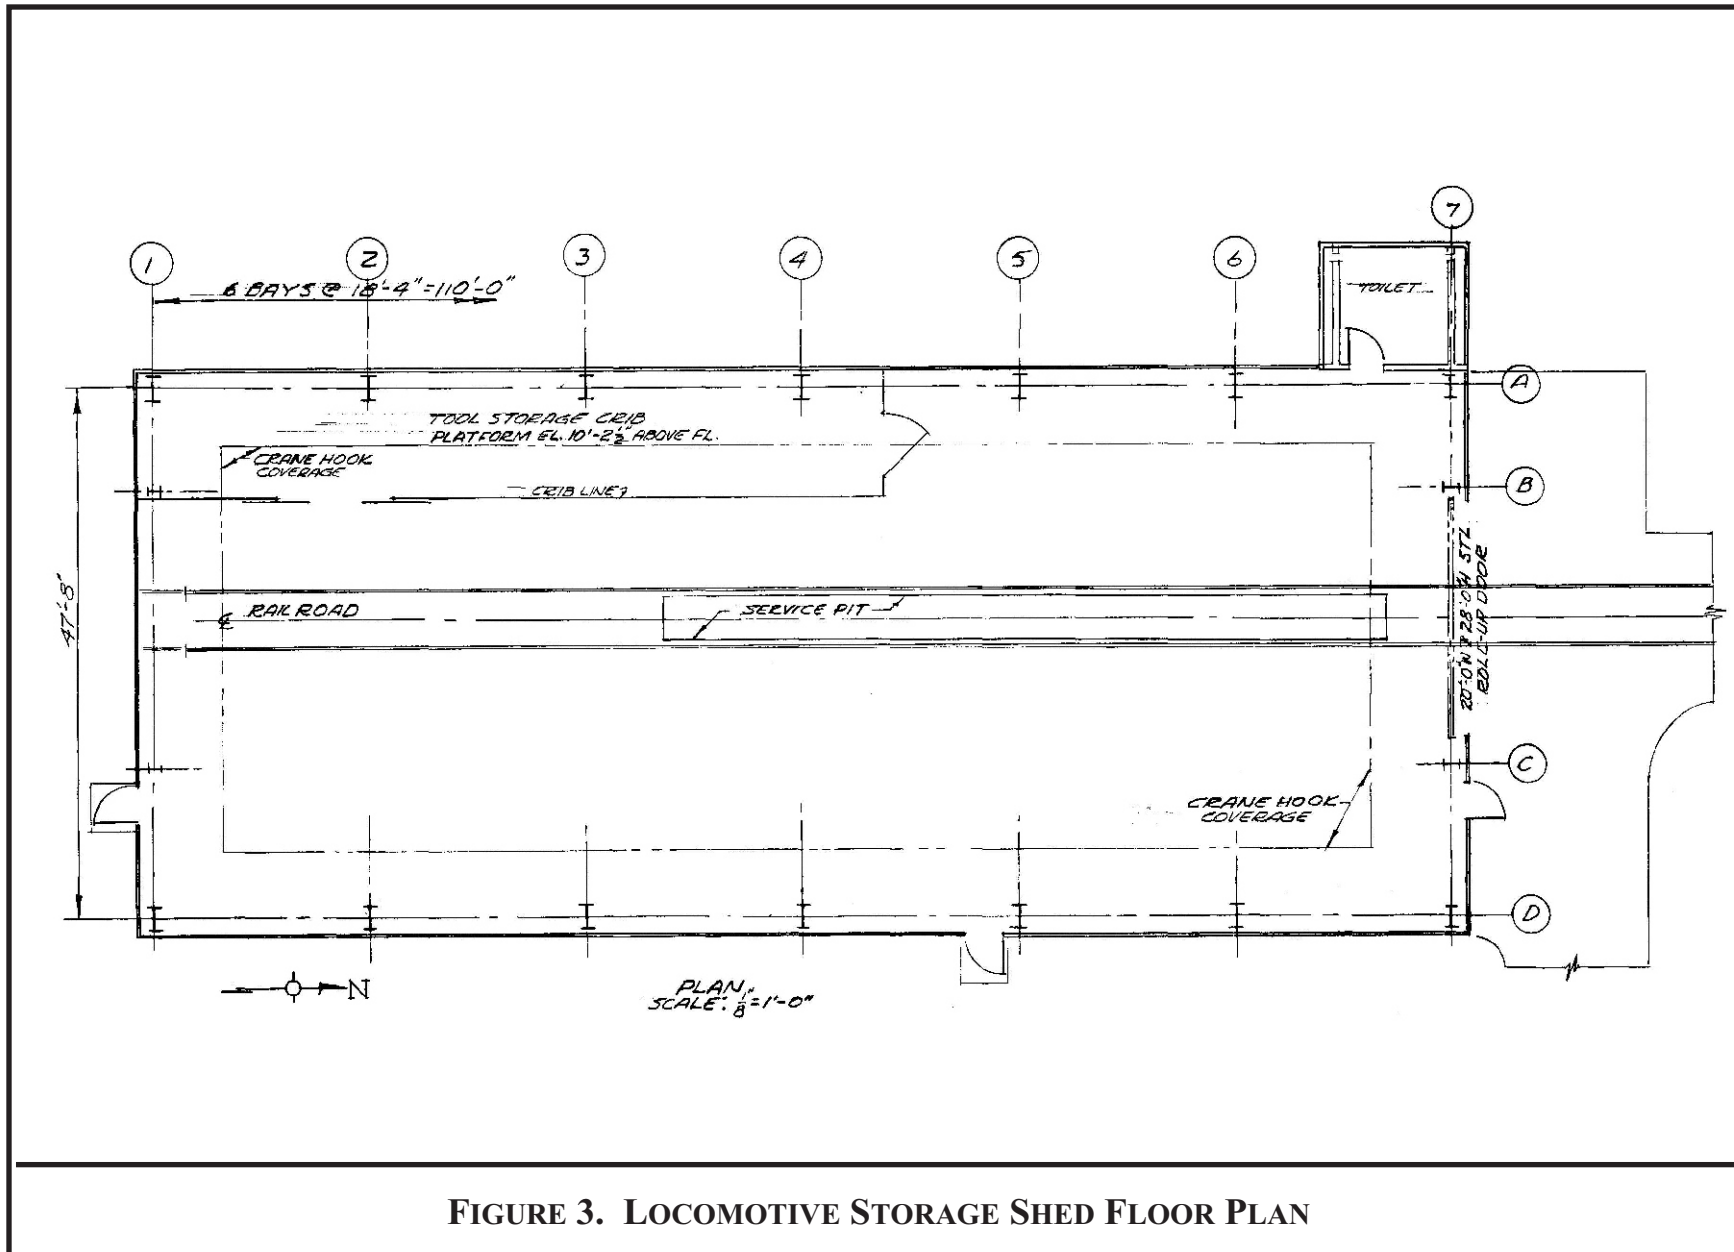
LOCOMOTIVE STORAGE SHED FLOOR PLAN
